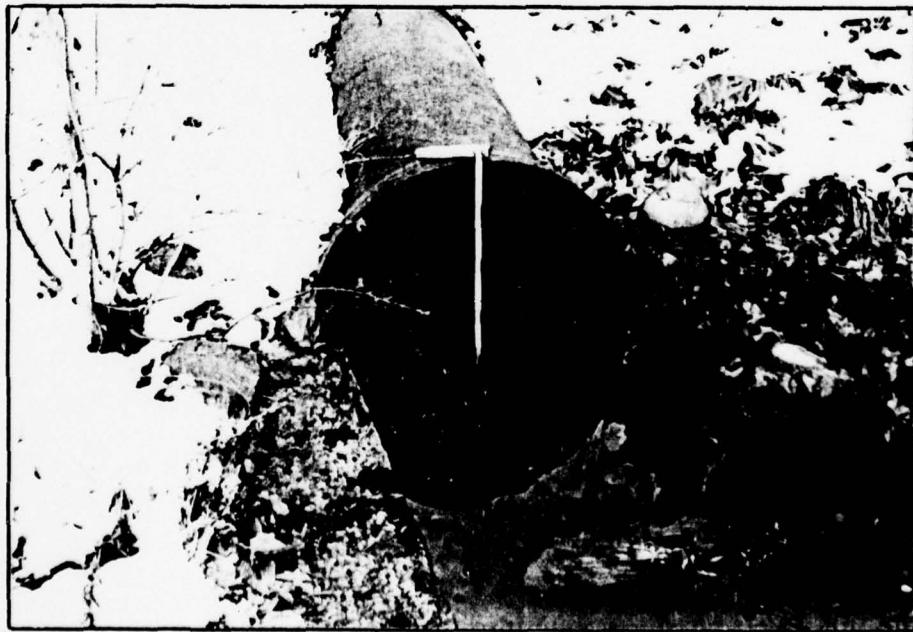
View of 24-inch Blow-off Pipe Showing "V" Notch Weir
